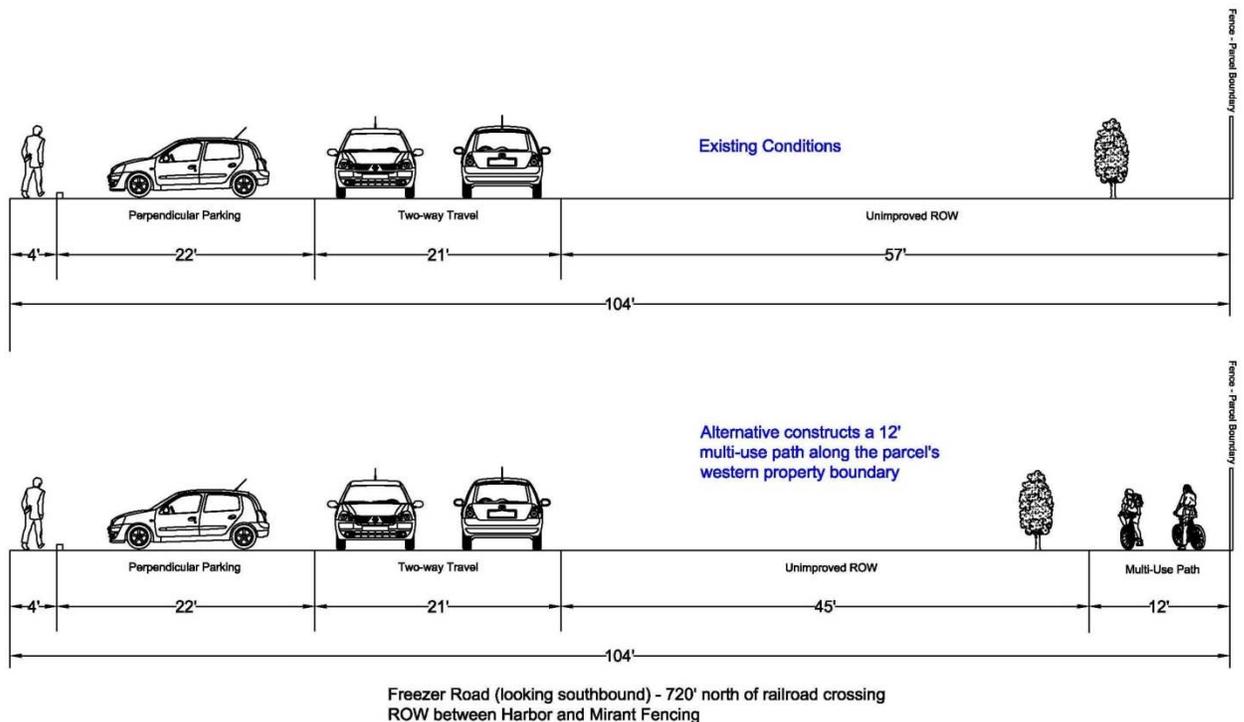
ALIGNMENT A SITE VIEWS AND CROSS-SECTIONS
